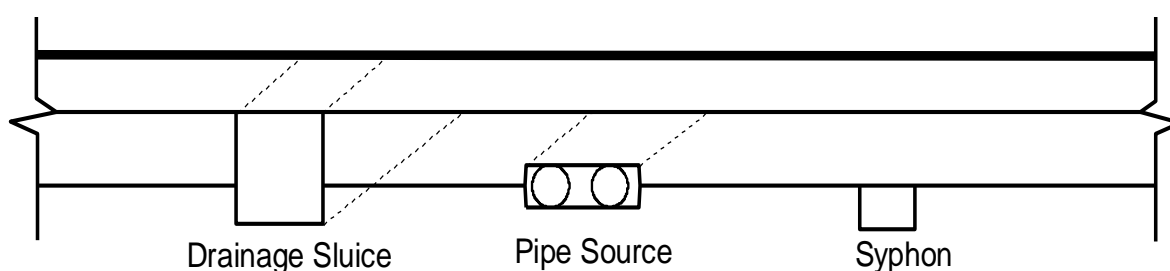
A schematic view of Drainage sluice, pipe sluice and siphon on embankment which relieve drainage congestion.
